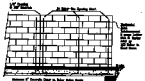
CONCRETE WALL PER FIG. 208 AND 209
